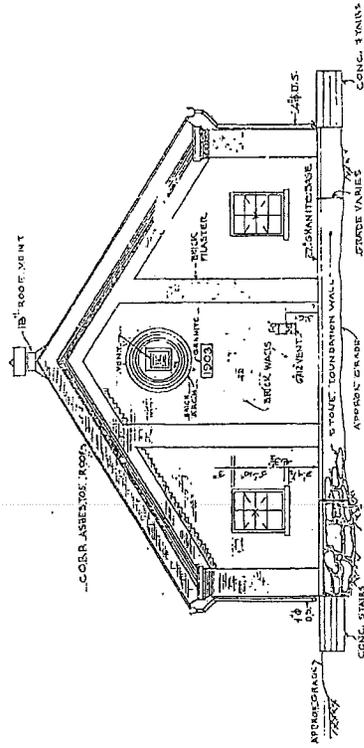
Building 952, Fixed Ammunition Magazine (1918), Picatinny Arsenal, Morris County, New Jersey (Kaplan 1996).
